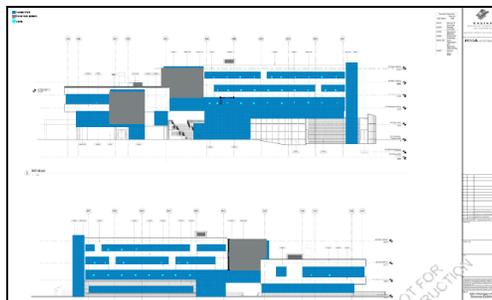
Colour-marking of curtain walls, sunscreen system, and vents, in elevation view
